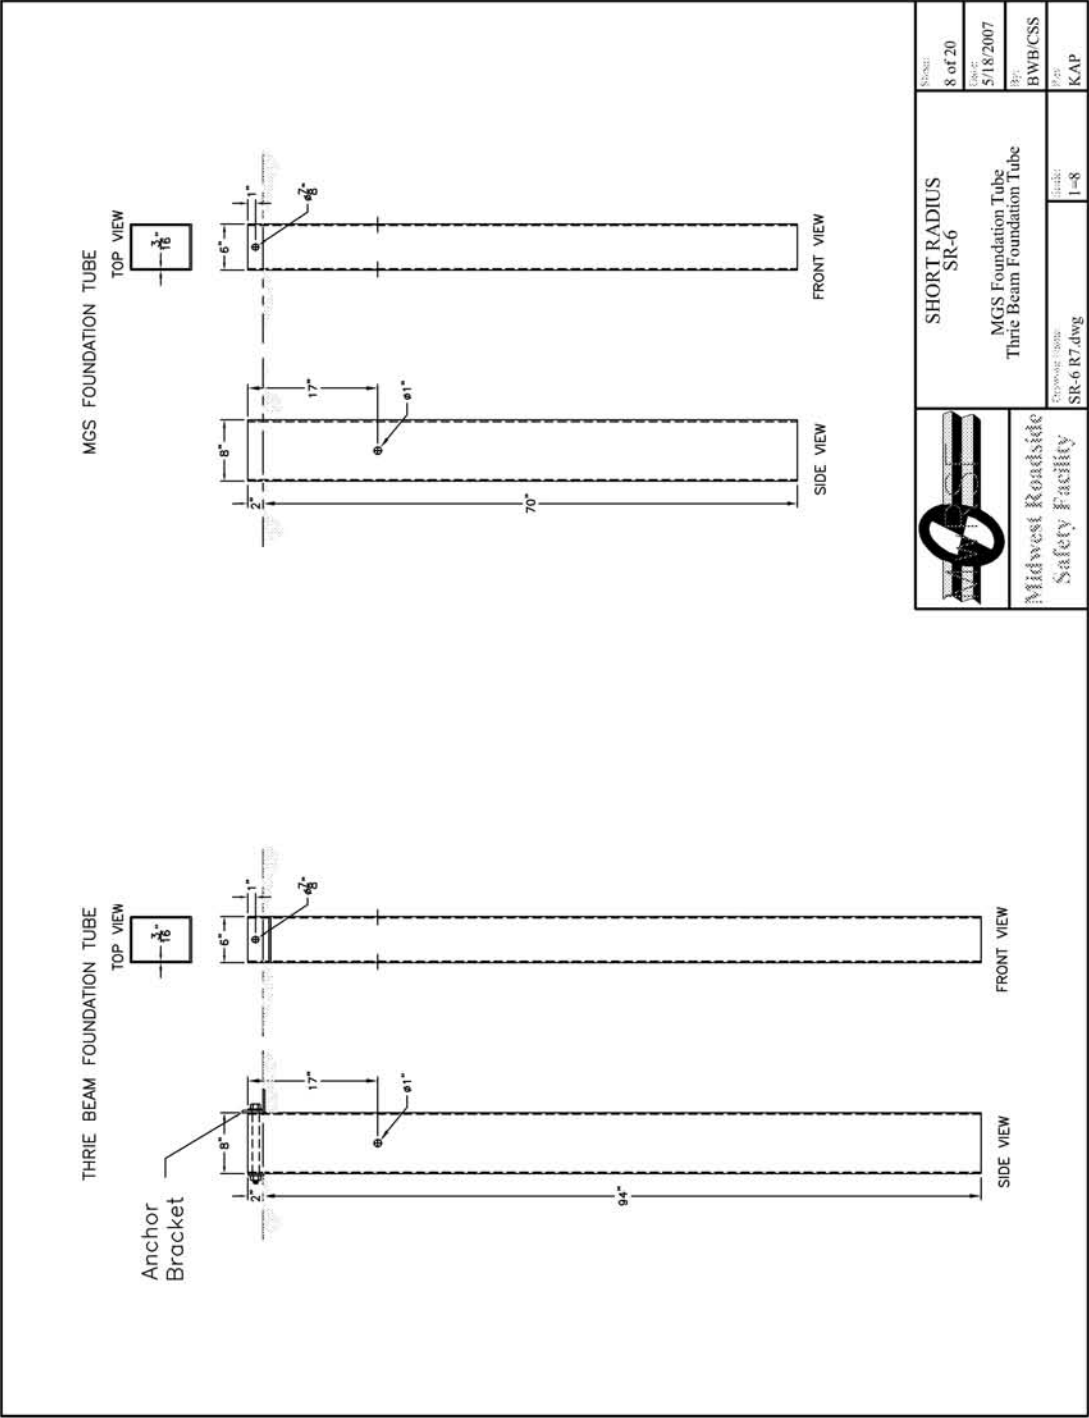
MGS and Thrie Beam Foundation Tube Details (English), Test SR-6
